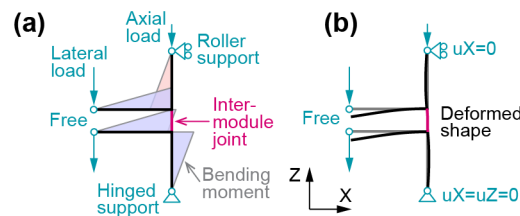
(a) Beam-column subassemblage with beam loading (J/B) showing bending moment, and (b) deformed shape of the beam-column subassemblage.
